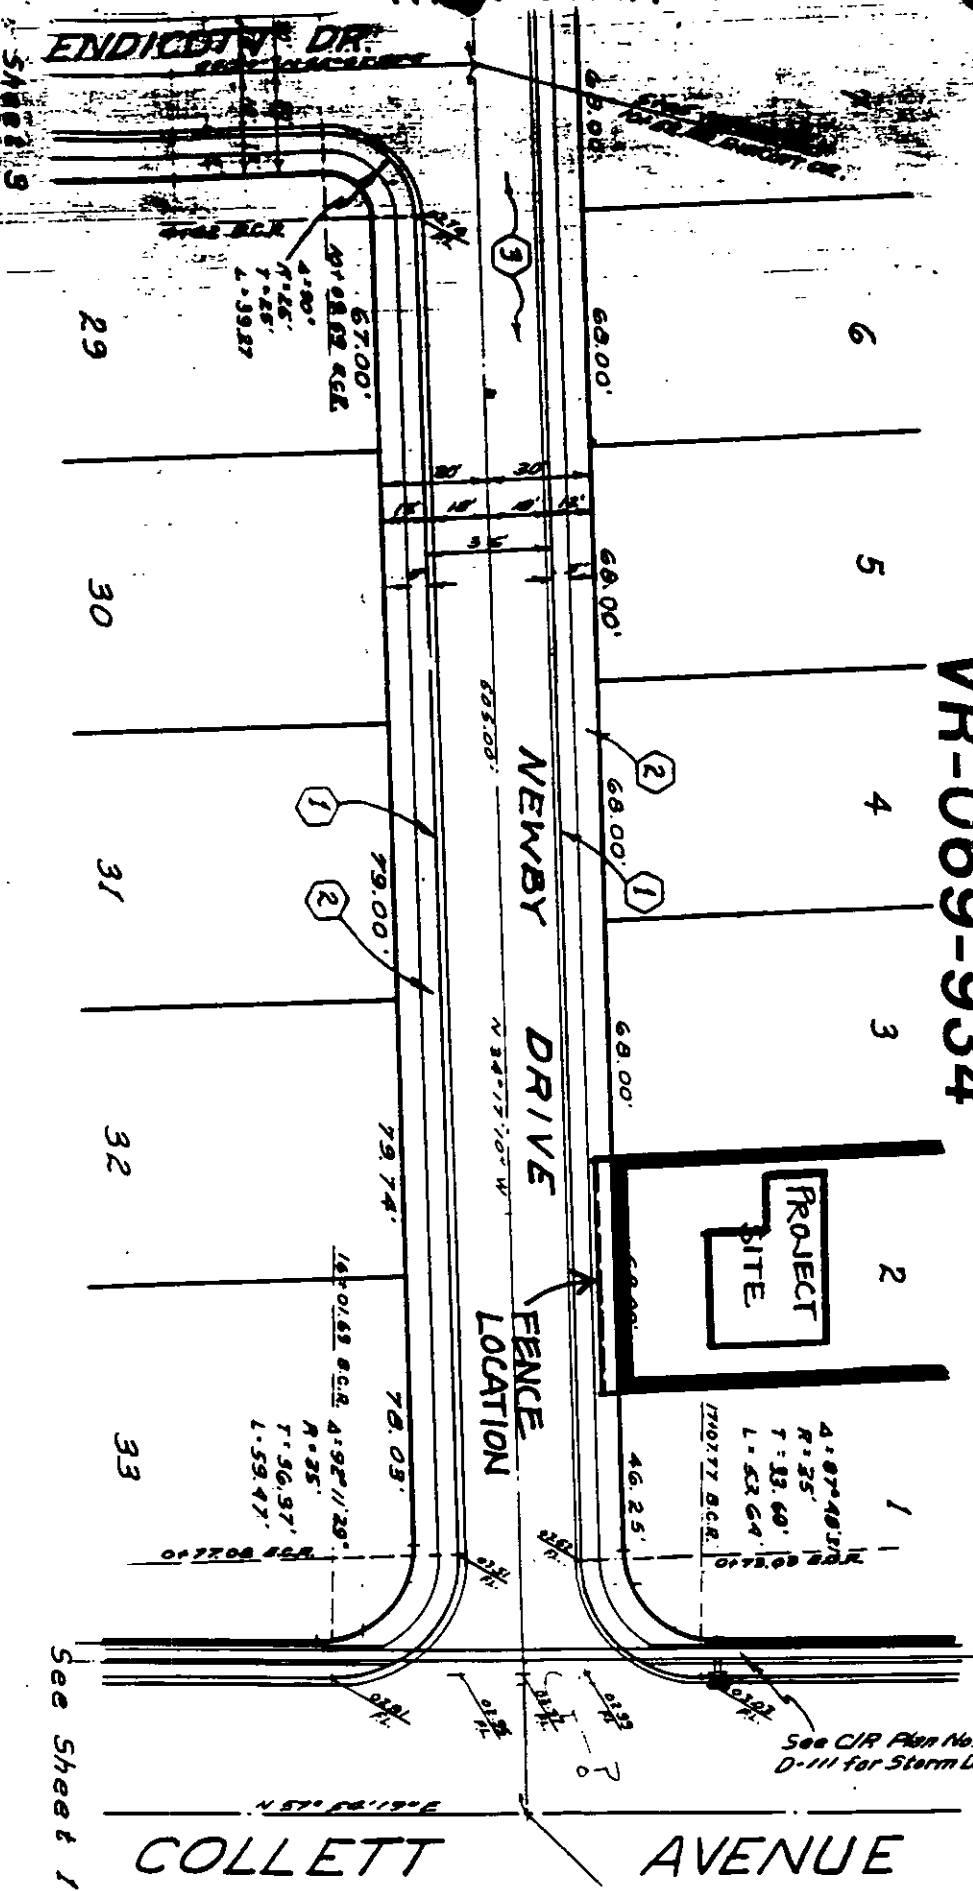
SHEET IMPROVEMENT PLAN
